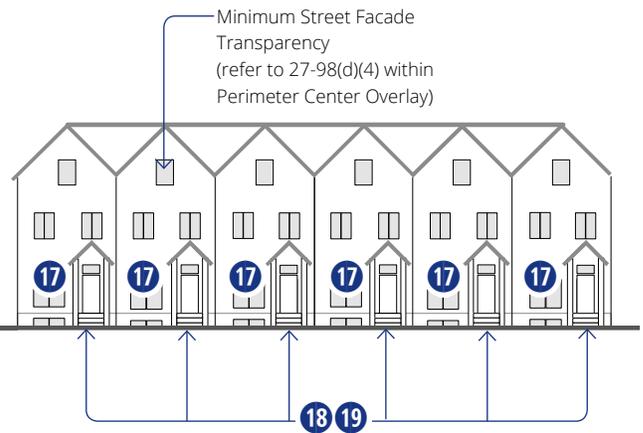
Townhouse Building: Street Facade Design Requirements
